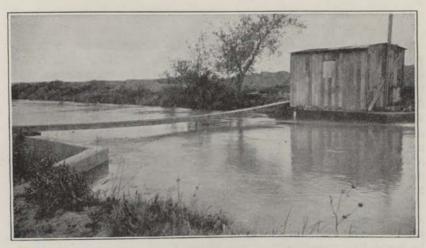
Old concrete rating flume and gage house on Holbrook Canal, typical of many old structures replaced by Parshall Measuring Flumes.
